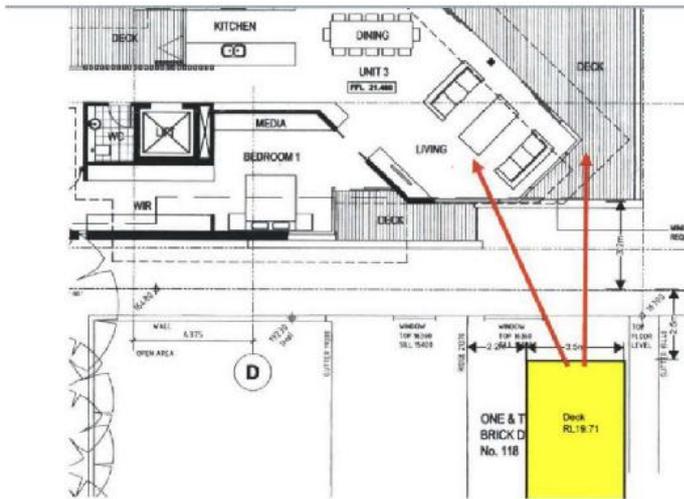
View lines from the proposed First Floor plans to the approved north-western development on behalf of No.120 Bower Street dated 31st May 2019.
